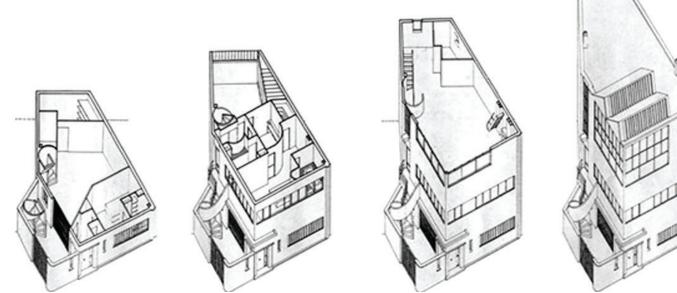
FIRST FLOOR PLAN Fig. 90 - SECOND FLOOR PLAN Fig. 91 - THIRD FLOOR PLAN Fig. 92 - ROOF PLAN
